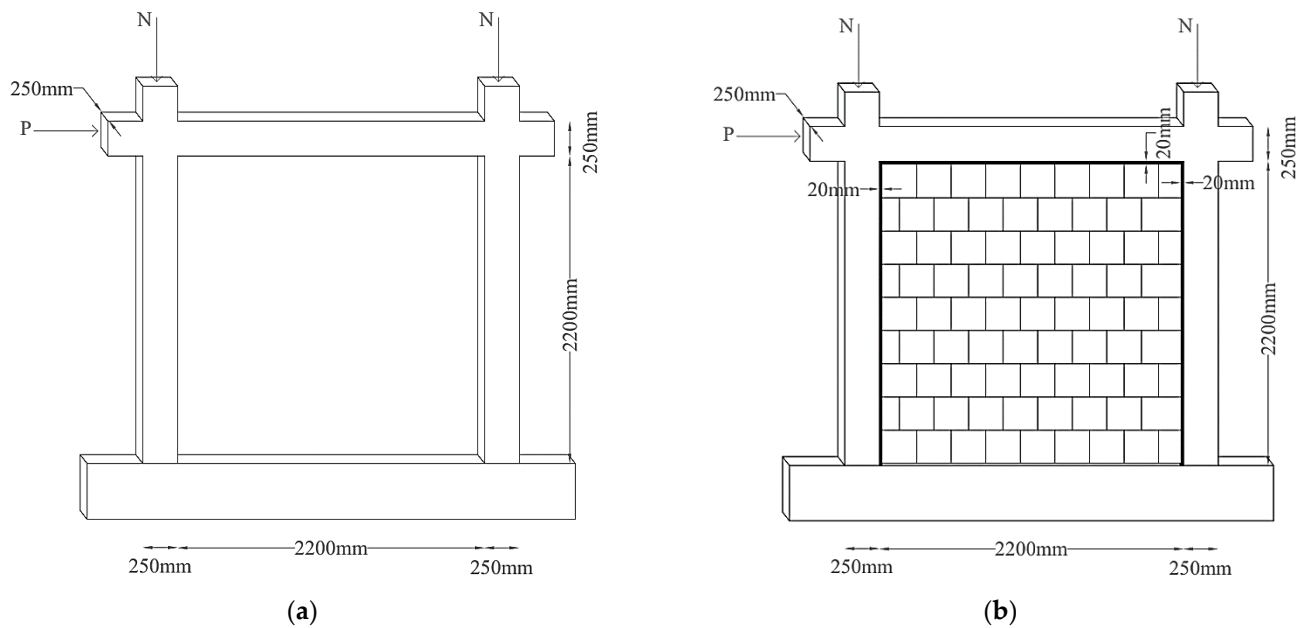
(a) Dimensions of the RC frame; (b) Specimen B2 with polymer joint applied on the 3 interfaces of the existing infill with the 2 concrete columns and the top beam.
